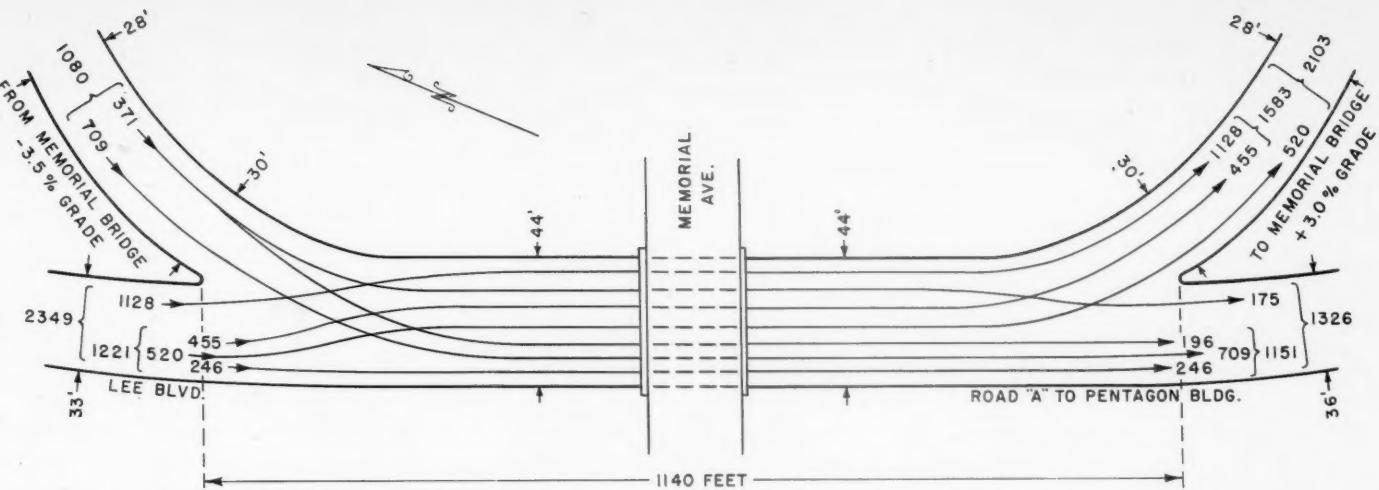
Weaving section on roadway under Memorial Avenue near west end of Memorial Bridge, Washington, D. C. (morning rush period, 7:45-8:45 a. m., November 13, 1947).
